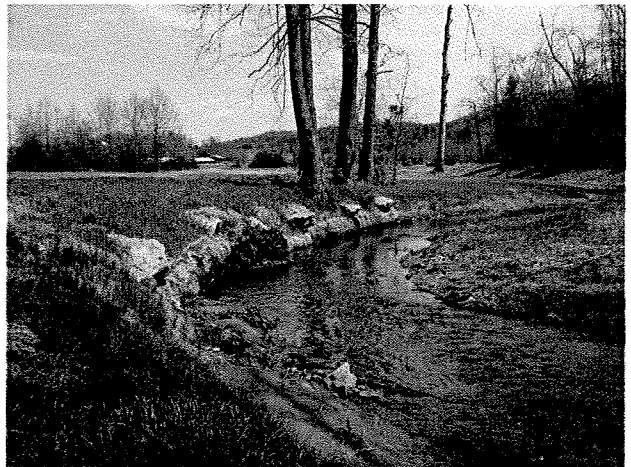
Looking downstream from MS Station 51+25 at log toe protection, root wads, and live branch layering (left bank). (9/27/04)
